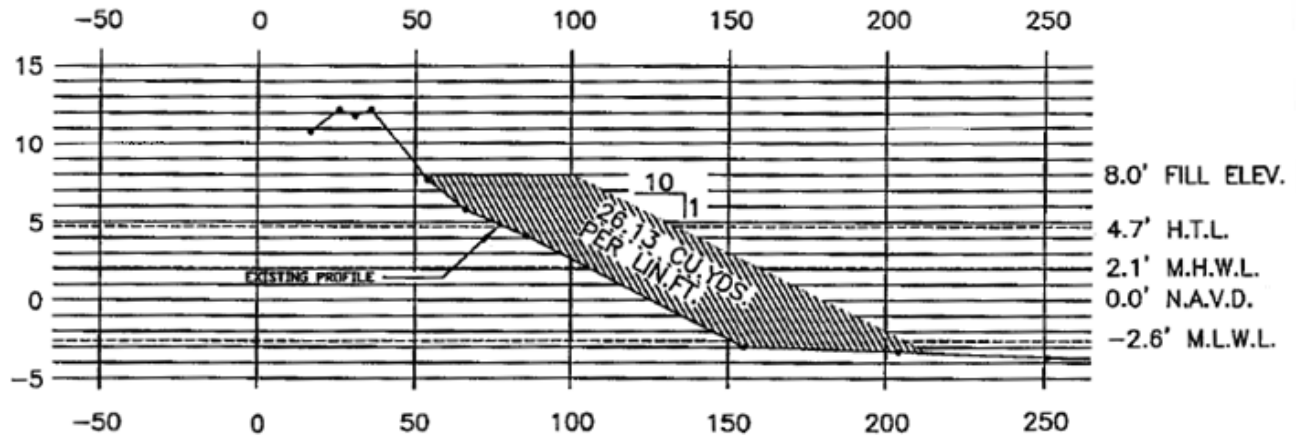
Typical fill section for previous projects at Slaughter Beach, vertical datum NAVD88 (taken from 2001 Corps permit application).
